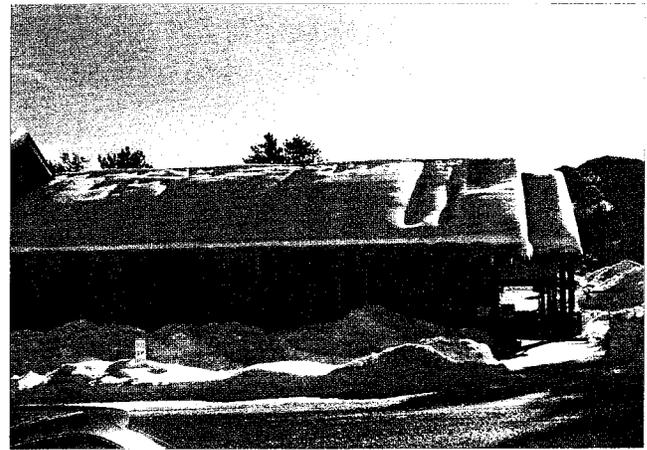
Looking southeast at the north roof of a lodge building. This roof appears to be a superhighway for the escape of heat from the interior of the building. The large thickness of snow on the lower edge of the roof and on the right (west) edge are examples of the North Eave Effect (12/31/06).
